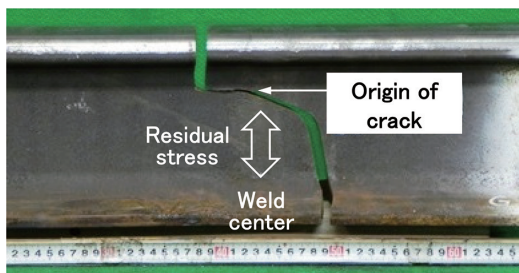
Example of horizontal split web that occurred at FB welds²⁾
